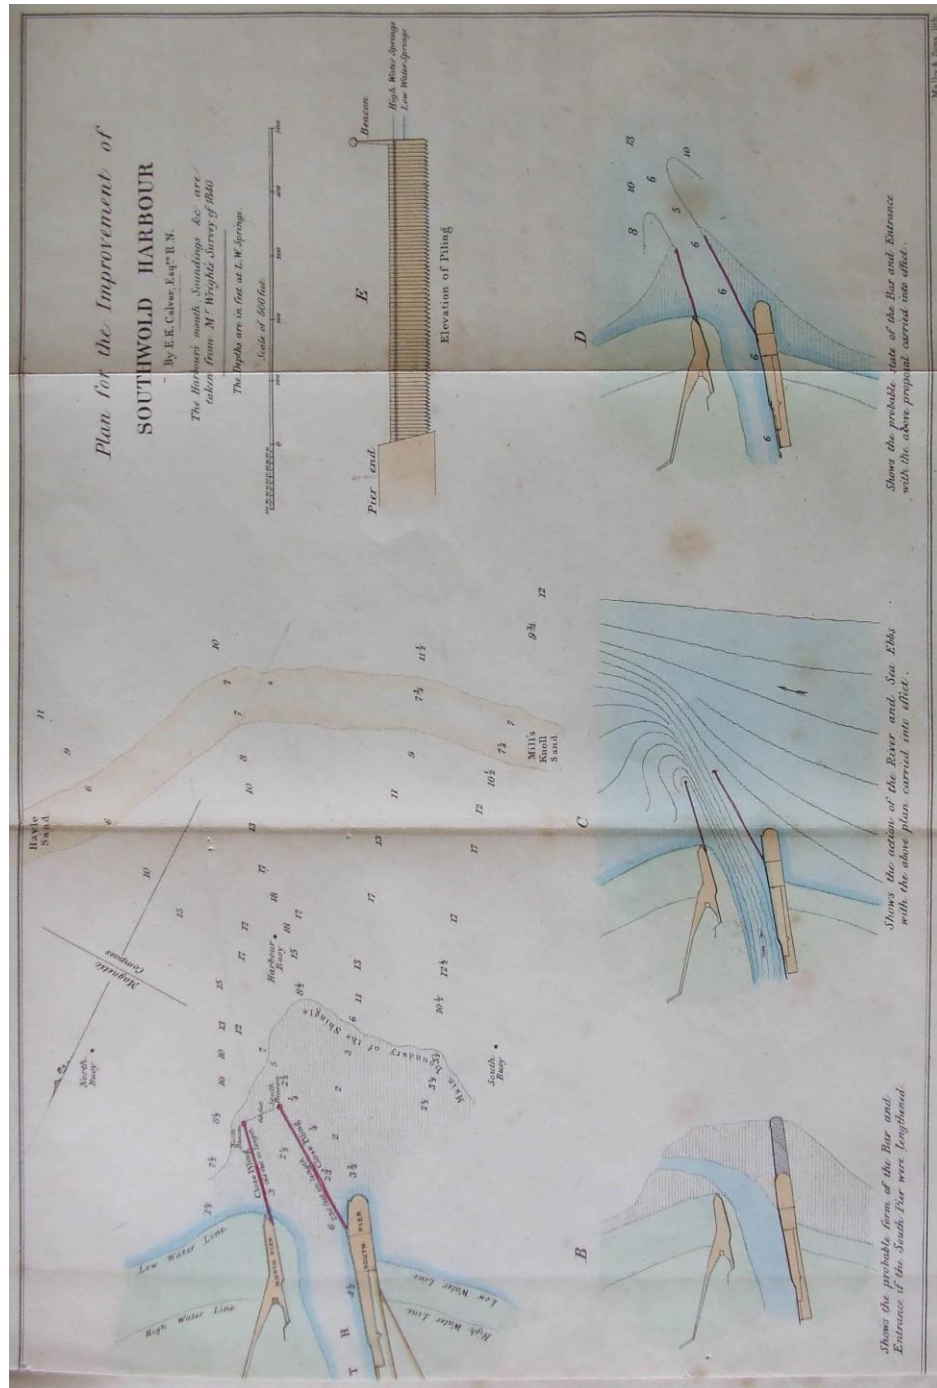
, Southwold. Calver's proposals of 1844 for extending the piers with walls of close piling. Note the drawings suggesting different bathymetric outcomes with various pier arrangements (SRO B15082.23)
